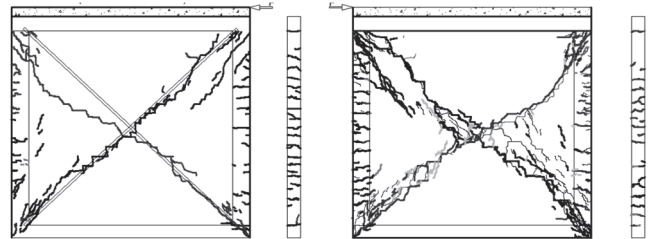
Cracking on the masonry wall after applying the complete load cycles. *Left*: wall cracking on the left side of the wall. *Right*: wall cracking on the right side of the wall. Source: The Authors
